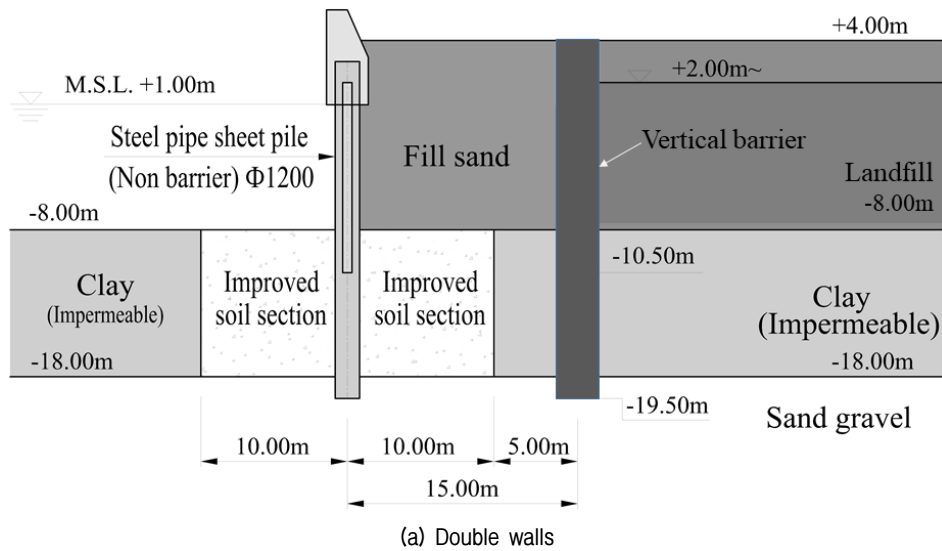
Cross section and soil condition of double walls system with clay (impermeable) layer
